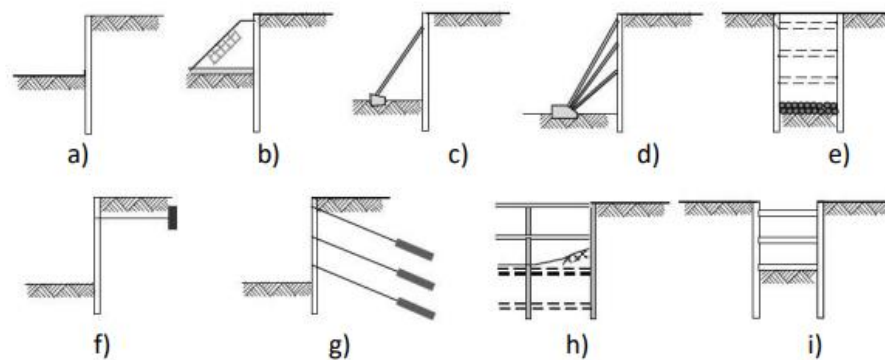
Common Types of Wall Support Schemes: (a) Cantilever wall; (b) Berm and slab; (c)
